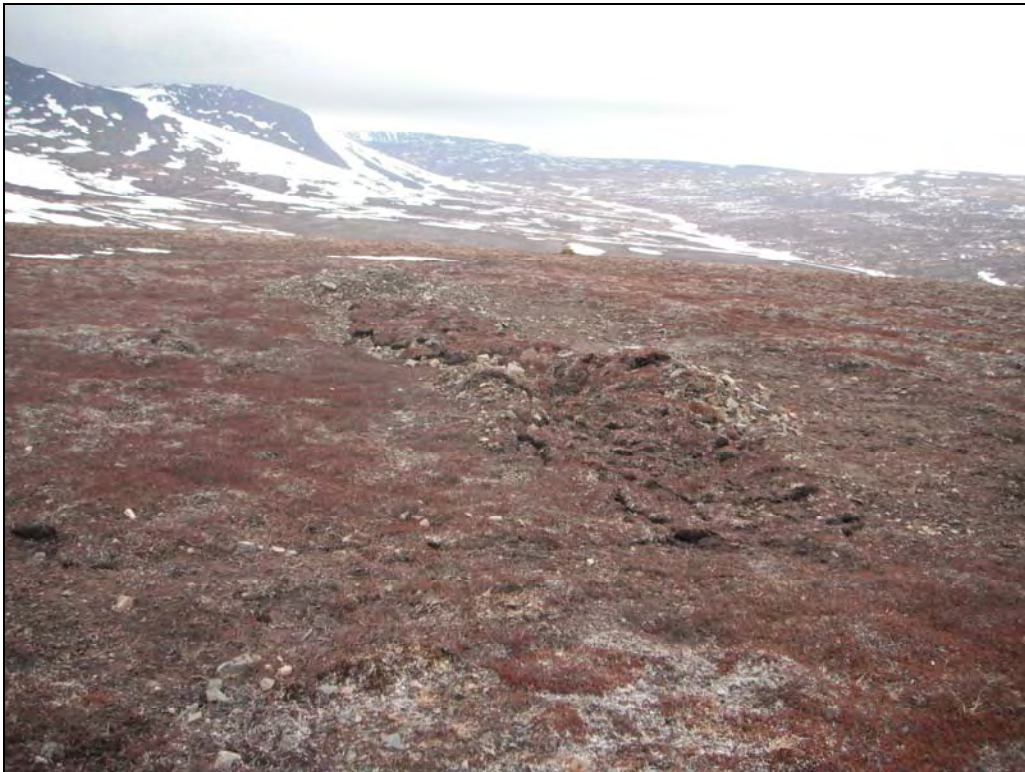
Reclaimed sump pit location. This site was completed in the Fall of 2010 and has not had a complete growing season.
